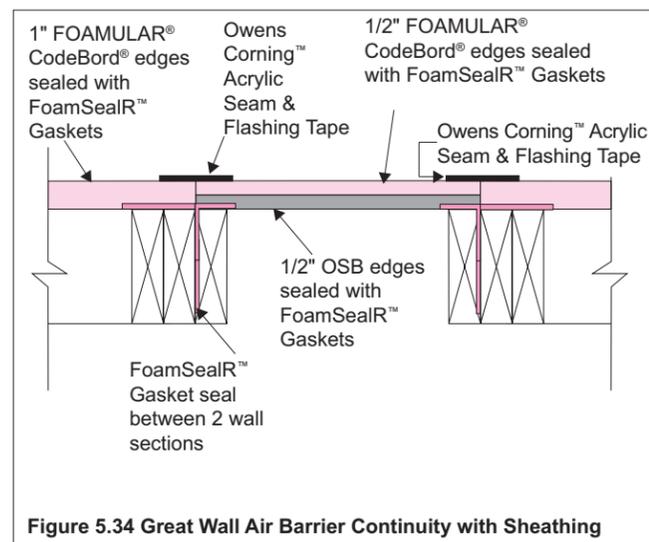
Great Wall Air Barrier Continuity with Sheathing
